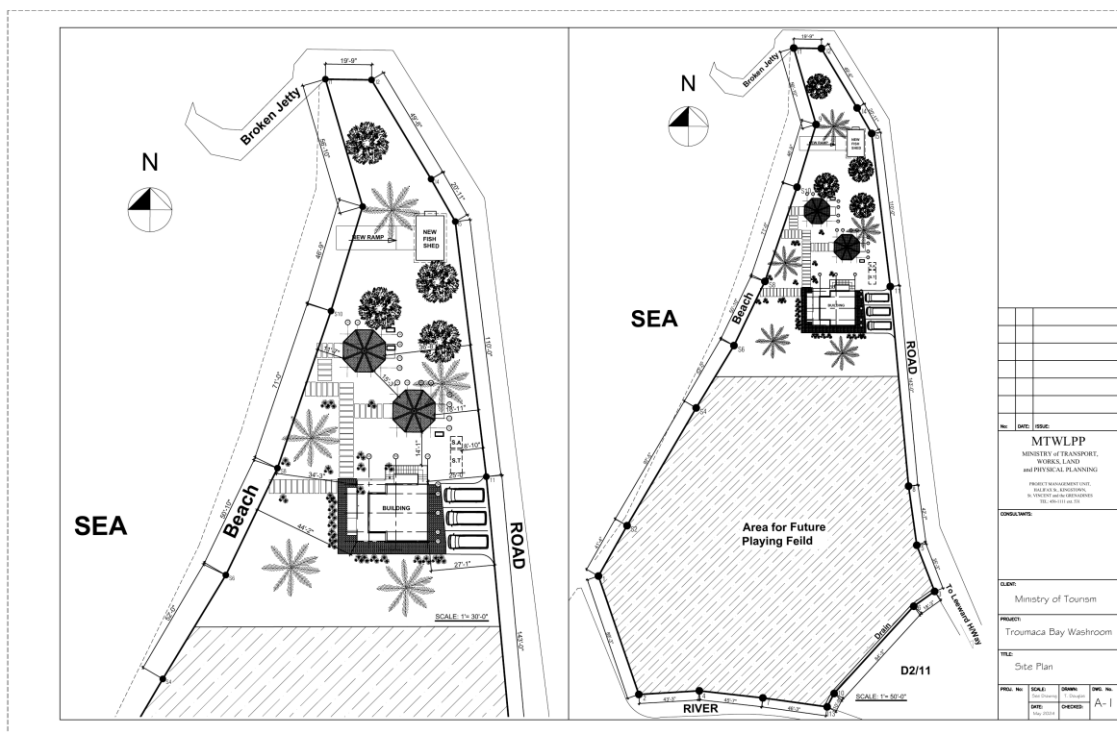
Beach Facility Building Site Plan (Dwg. A-1, MTWLPP, Project: Troumaca Bay Washroom) - for orientation only. Refer to Annex A for the full, dimensioned drawing set.
